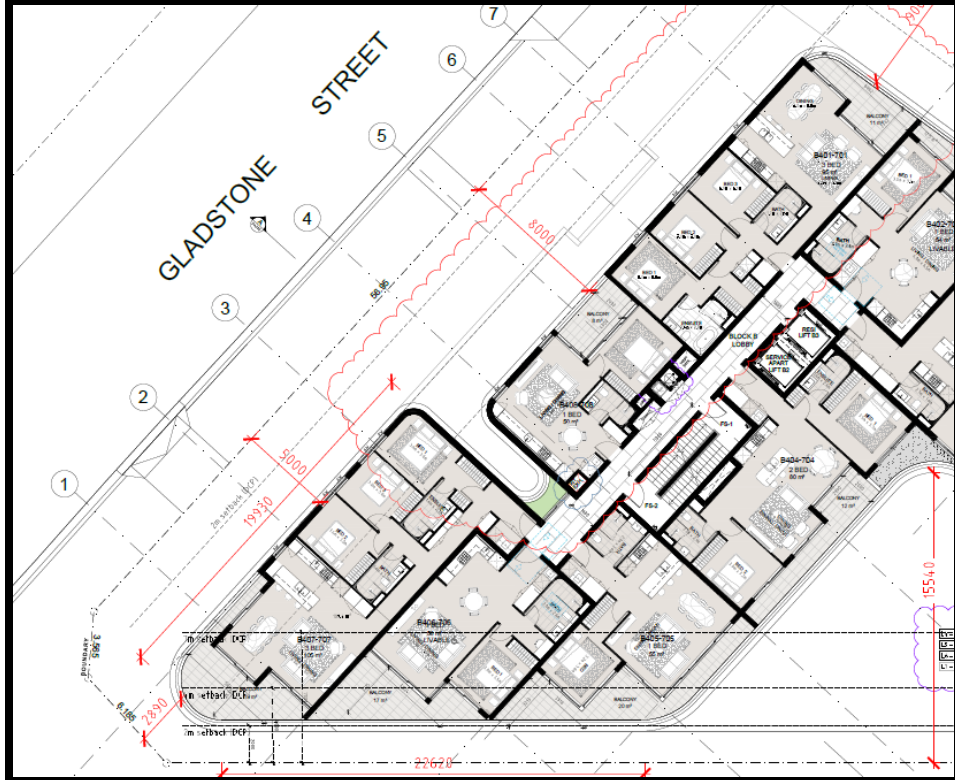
Plan showing the varied setbacks and indentation to Gladstone Street.
